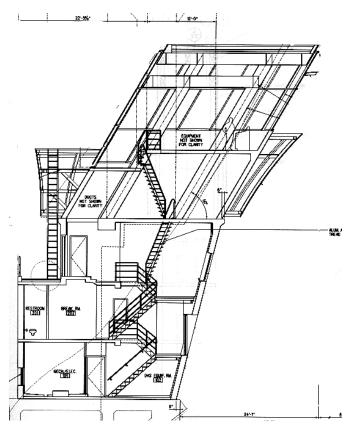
DETAIL OF DRAW BRIDGE SPAN WITH OPERATOR TOWER
